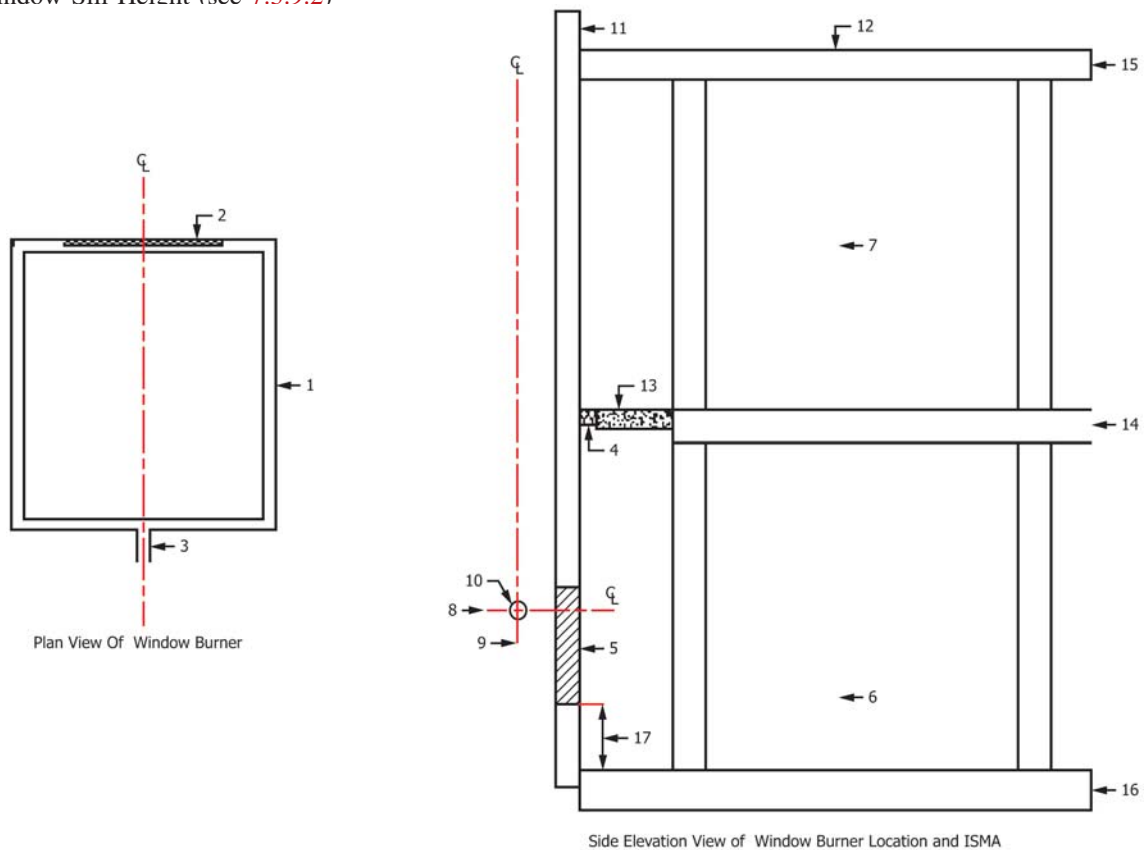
Plan View of Window Burner and Side Elevation View of Window Burner Location
